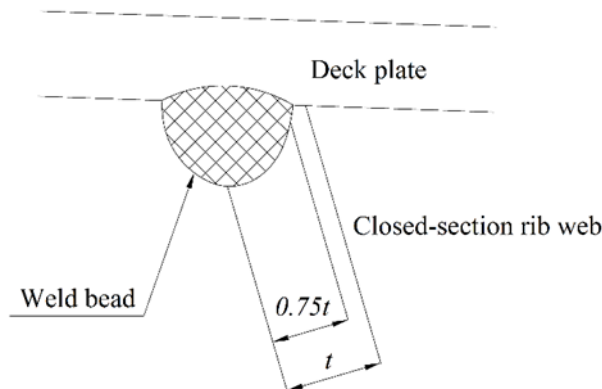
Amount of Penetration in the Welding of Longitudinal Rib and Deck Plate
